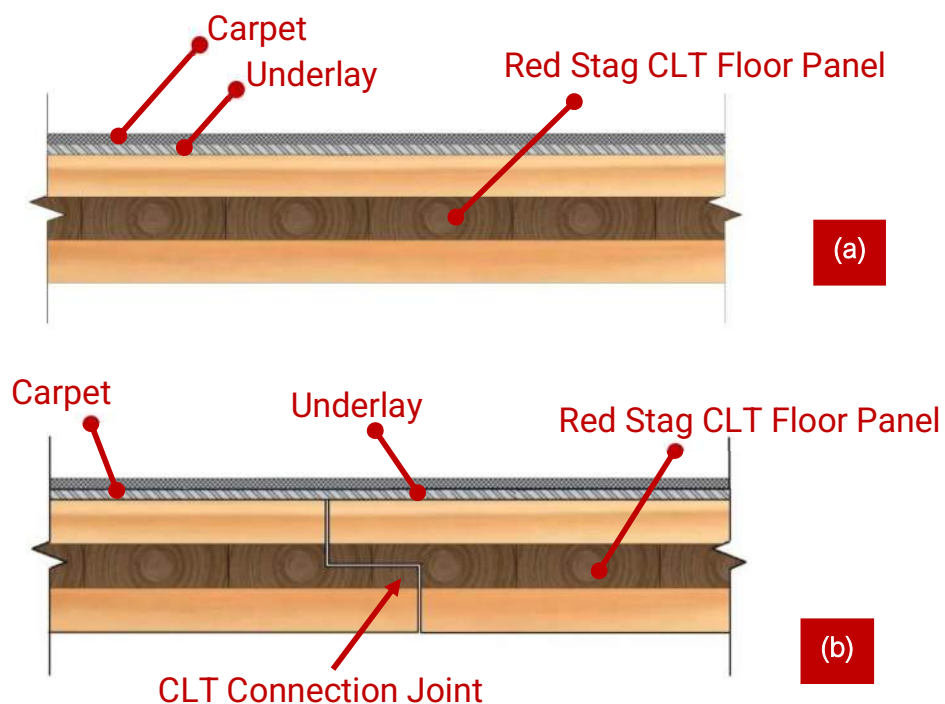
Red Stag CLT with carpet overlay; (a) single solid CLT floor panel; (b) Two CLT panel connect at by lap joint. Note that the underlay joints should be sufficiently far away from the CLT connection joints to ensure a monolithic substrate (refer to flooring providers specifications).
